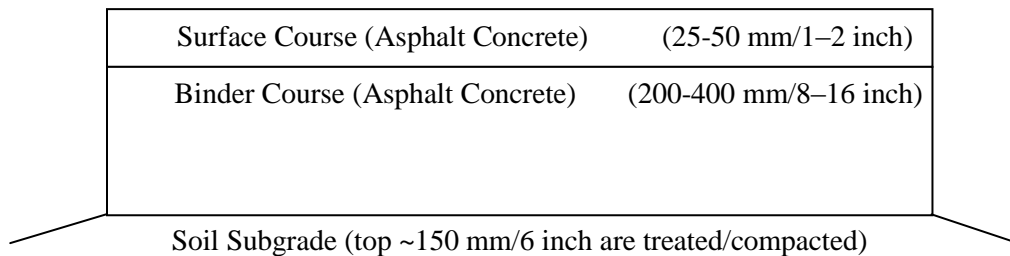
Typical Cross Section of Full-Depth Asphalt Pavement
